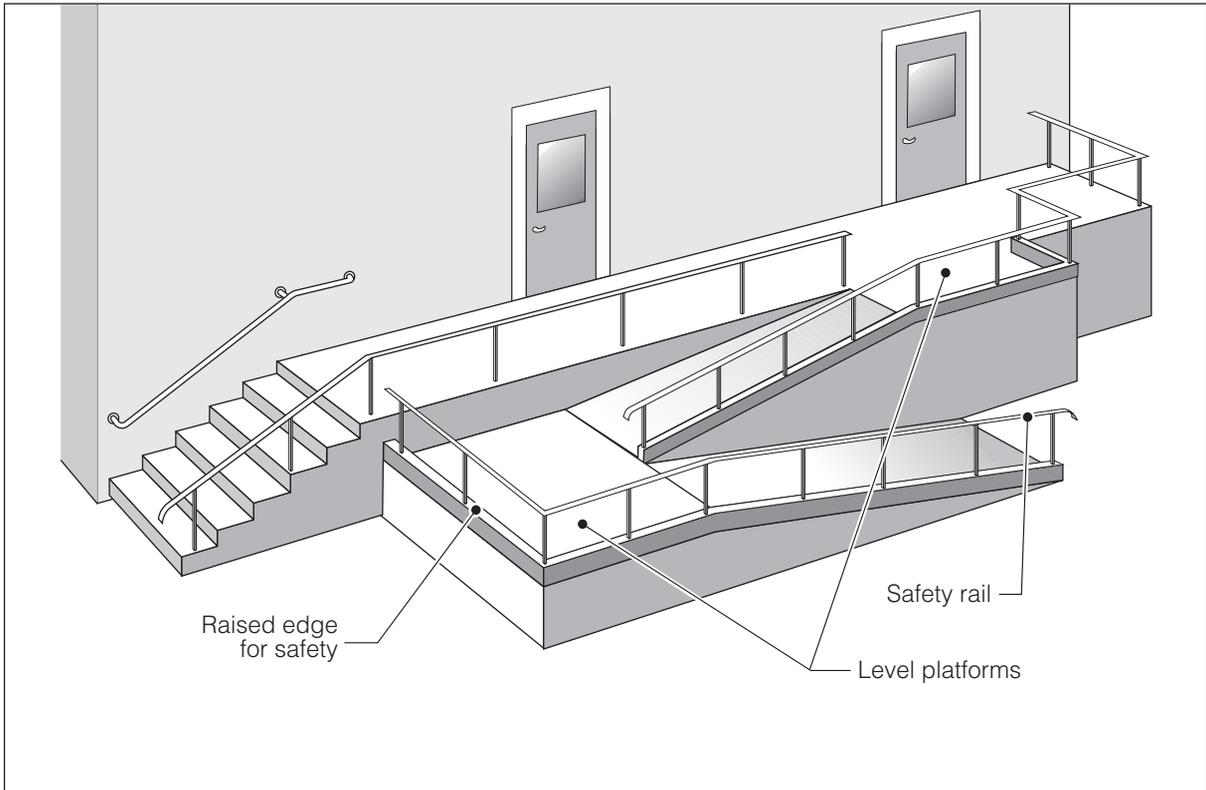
Alternative layout for ramp, with mid-level resting platform.
